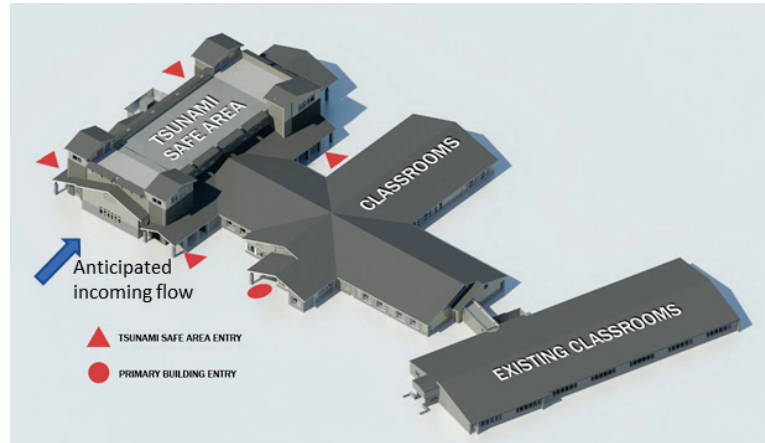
Tsunami refuge area on roof of new activities wing at Ocosta Elementary School (image courtesy ASCE and TCF Architecture).
